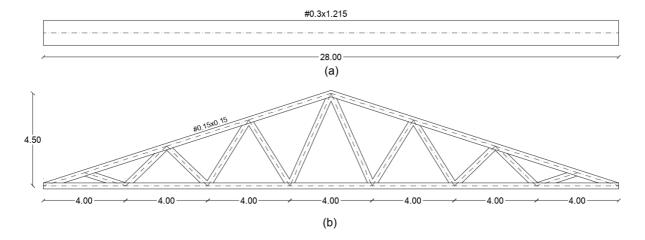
Detailing of the design of the timber structures (the measurements are shown in metres)
